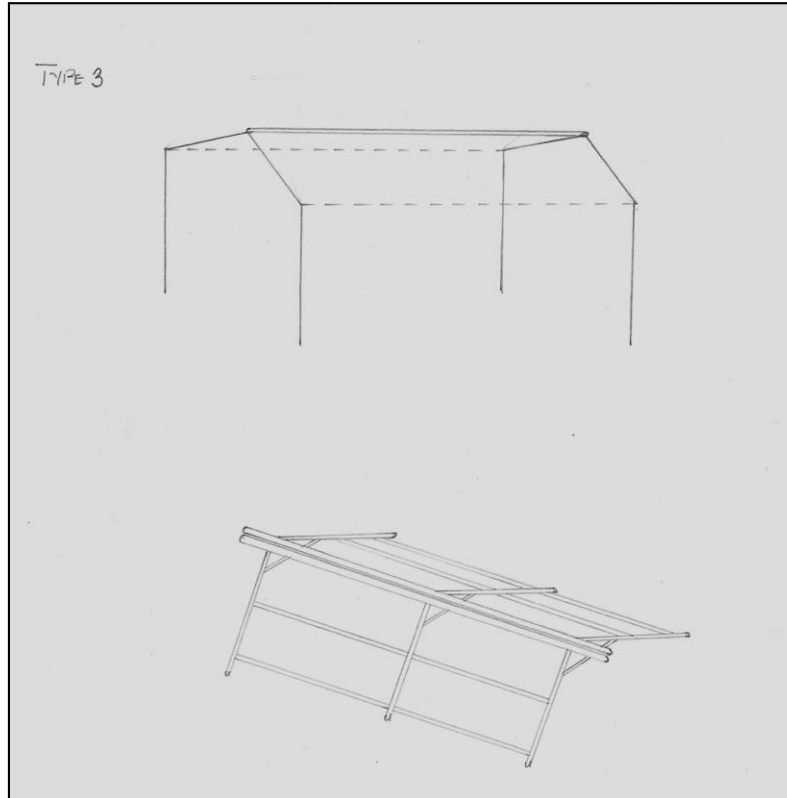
Type 3A- Framework for the triangular truss roof with aluminium zinc material (by Author and M. Ameyo-Xa)
